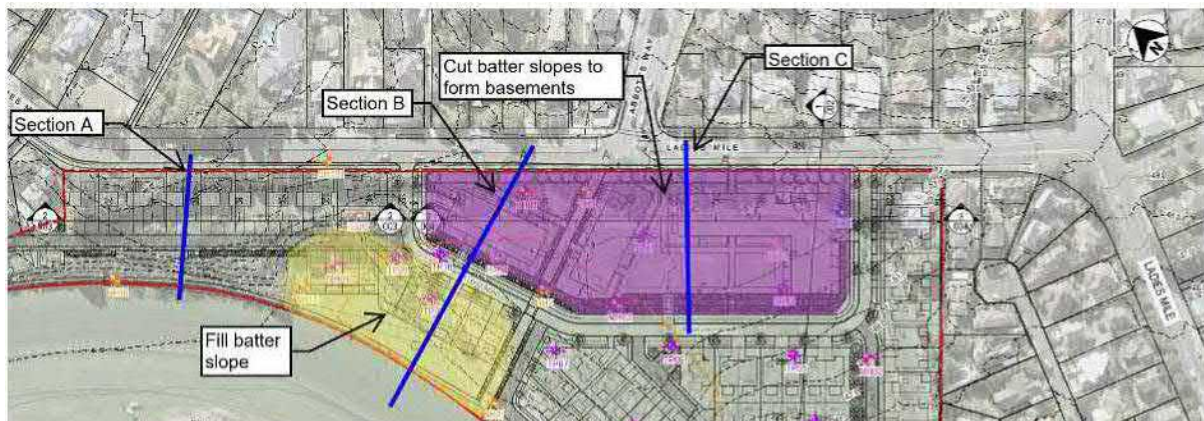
Approximate extents of proposed fill and cut batter slopes and critical stability sections considered
